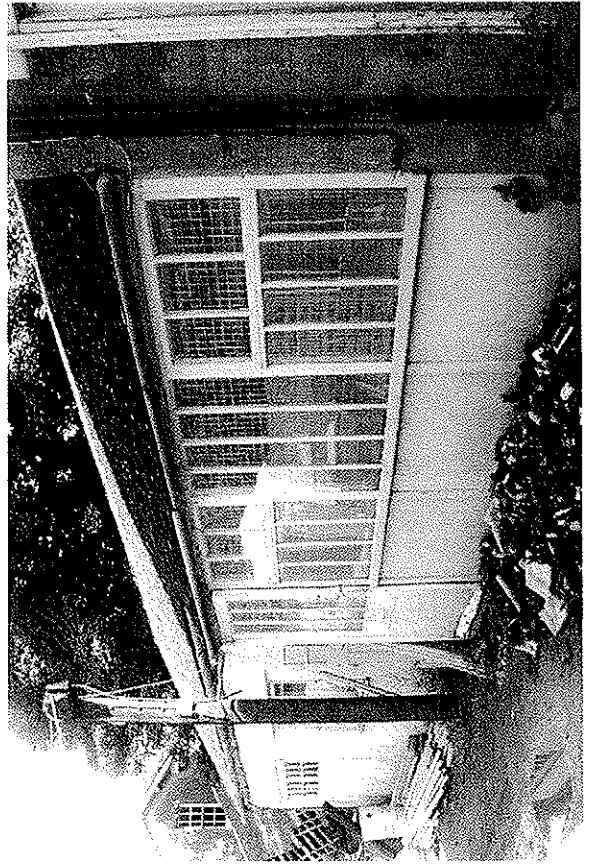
Building C/1.1-1.2. Detail showing construction of cast *in-situ* concrete wall and pier with integral softwood trimmer supporting floor joists of first floor. Note similarity of construction to remains of building 3 (plate 3.1)
